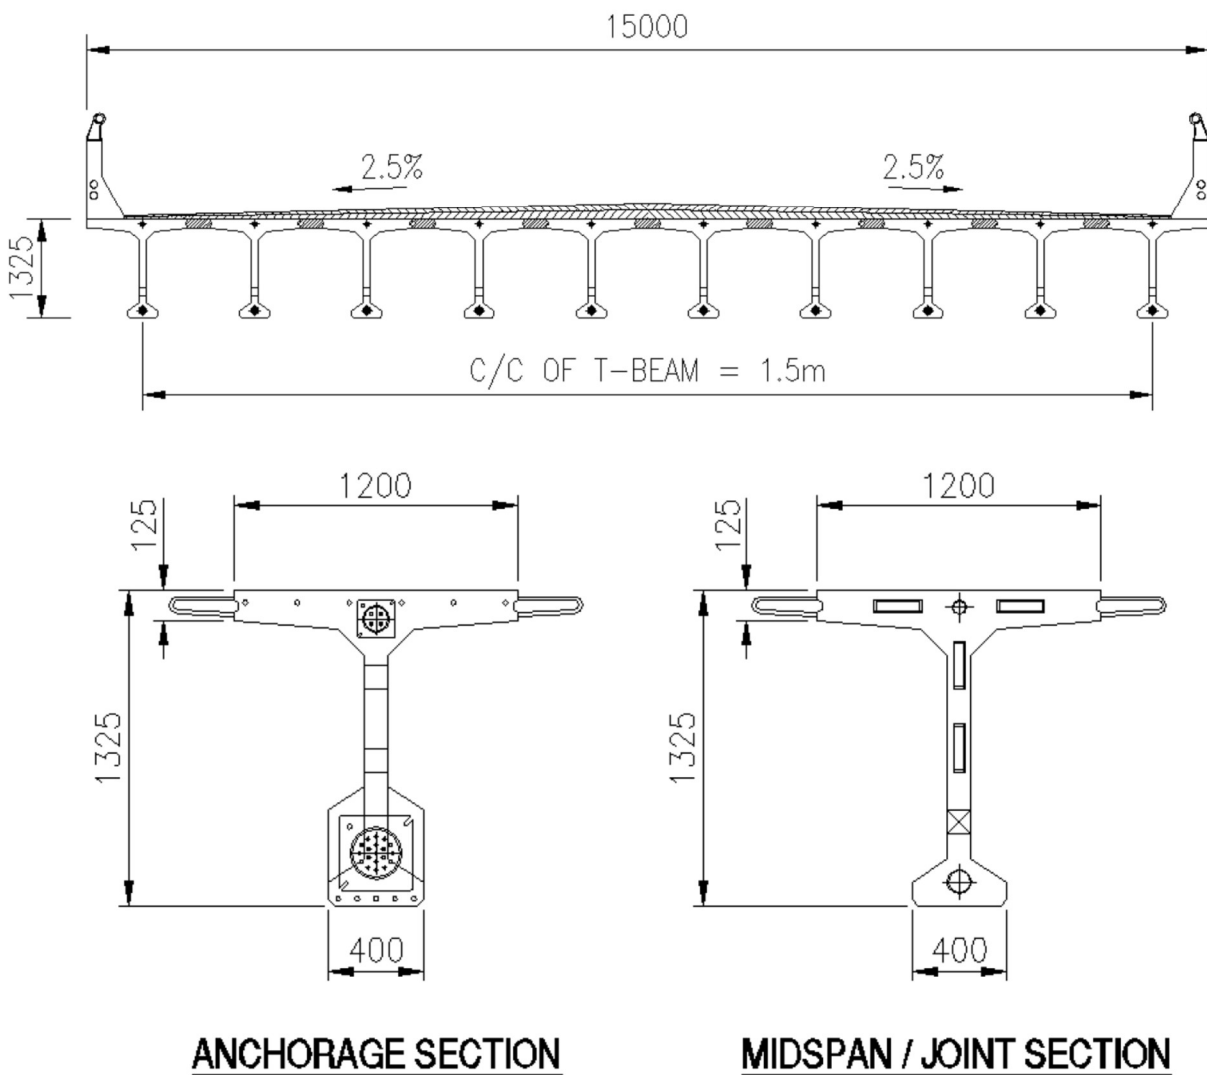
Cross Section of UHPC T-Beams of Sungai Nerok Bridge (Voo, et al. 2014)
